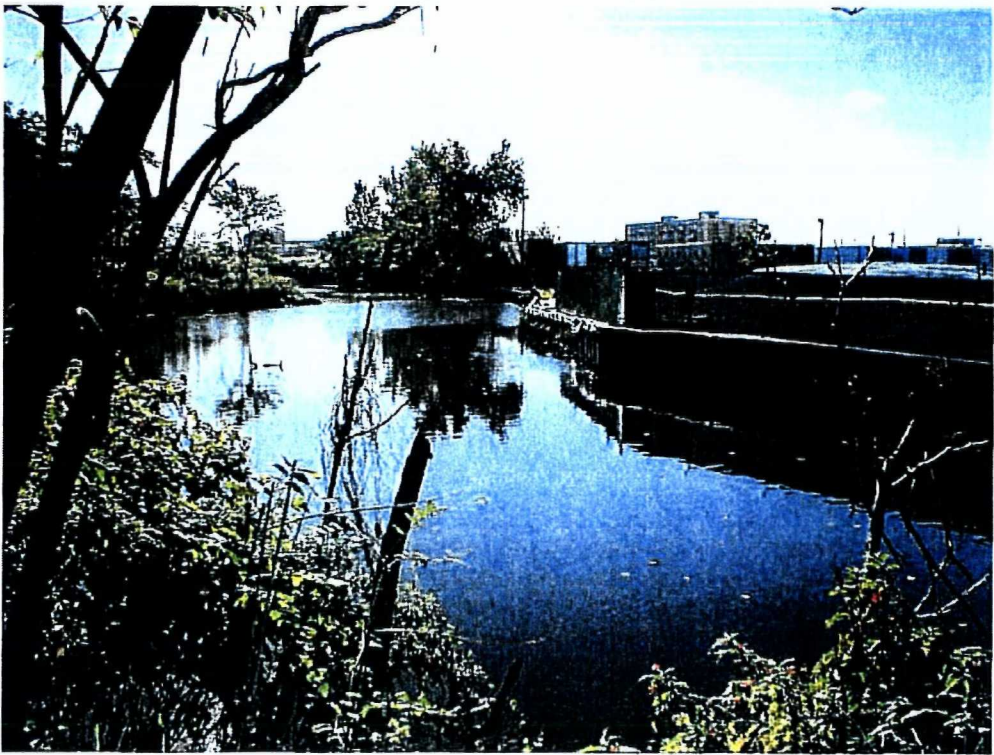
Photo J – View, facing south, of the existing bulkhead and Peach Island Creek.
